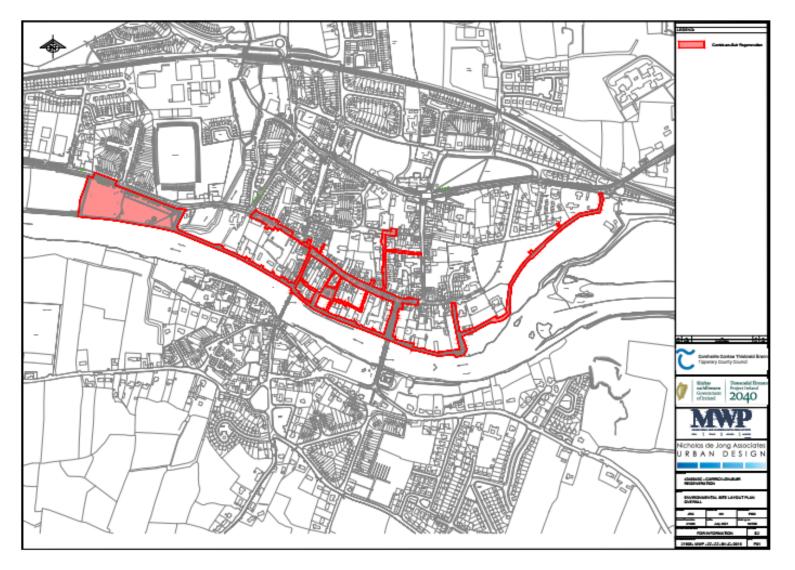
Proposed Site Layout (Site Boundary Outlined in Red)
